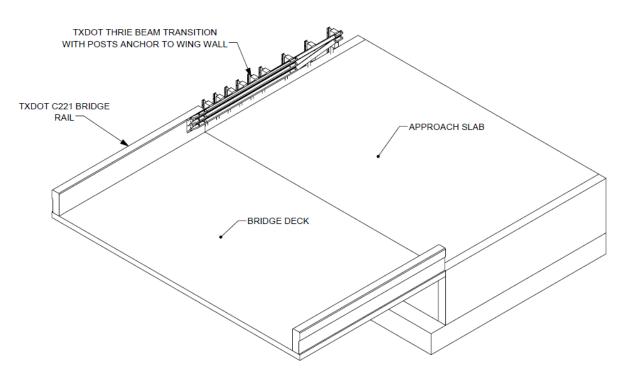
TxDOT Transition Anchored on Top of 12-Inch Wide Wing Wall.
